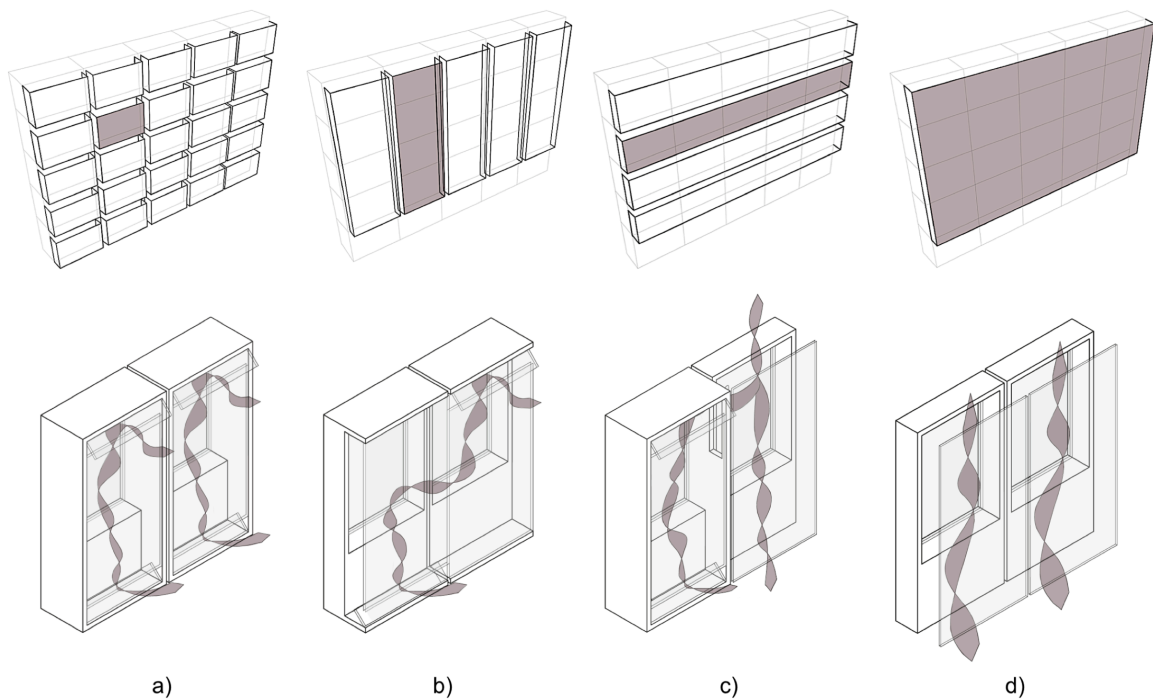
Basic types of DSF: a) box-window façade, b) shaft-box façade, c) corridor façade and d) multi-storey (or second skin) façade
